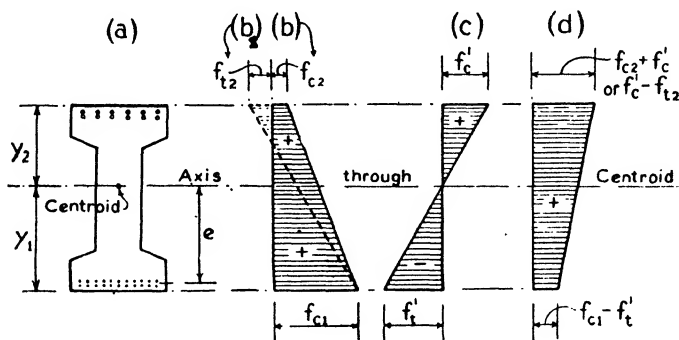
Distribution of Stresses in a Prestressed Concrete Beam.
